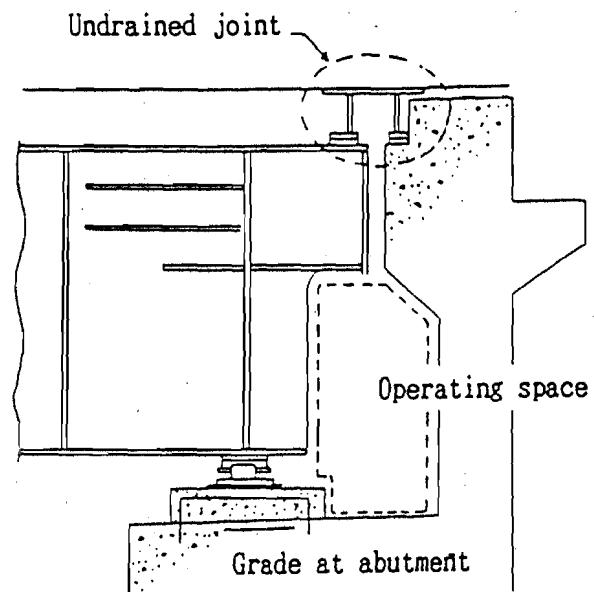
Undrained joint between approach and bridge deck and grade at abutment should be provided.
